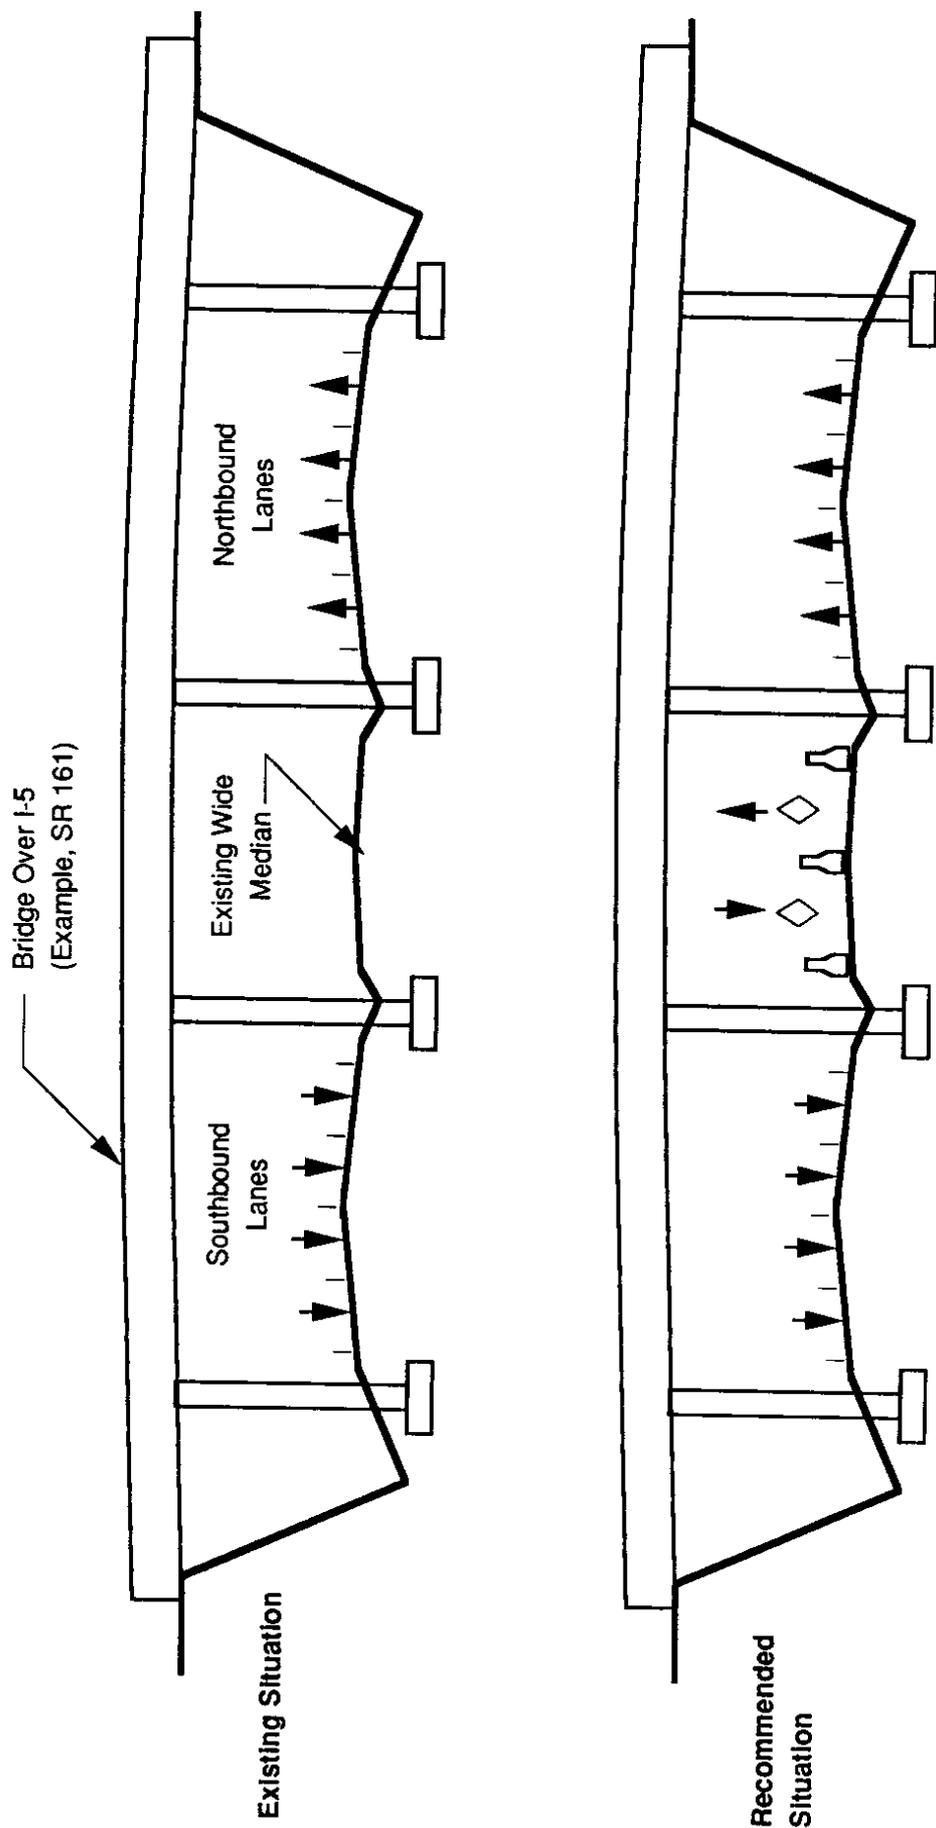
I-5 Barrier Separated HOV Lanes (Cross Section)
